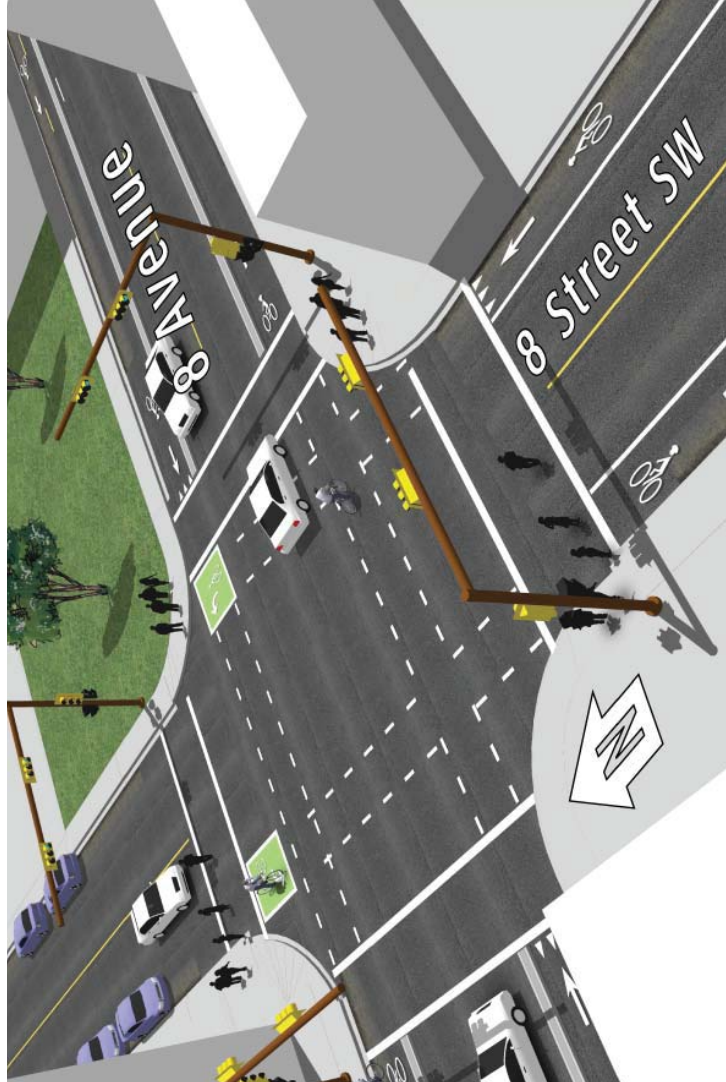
8 Avenue S and 8 Street SW intersection treatment looking northeast
